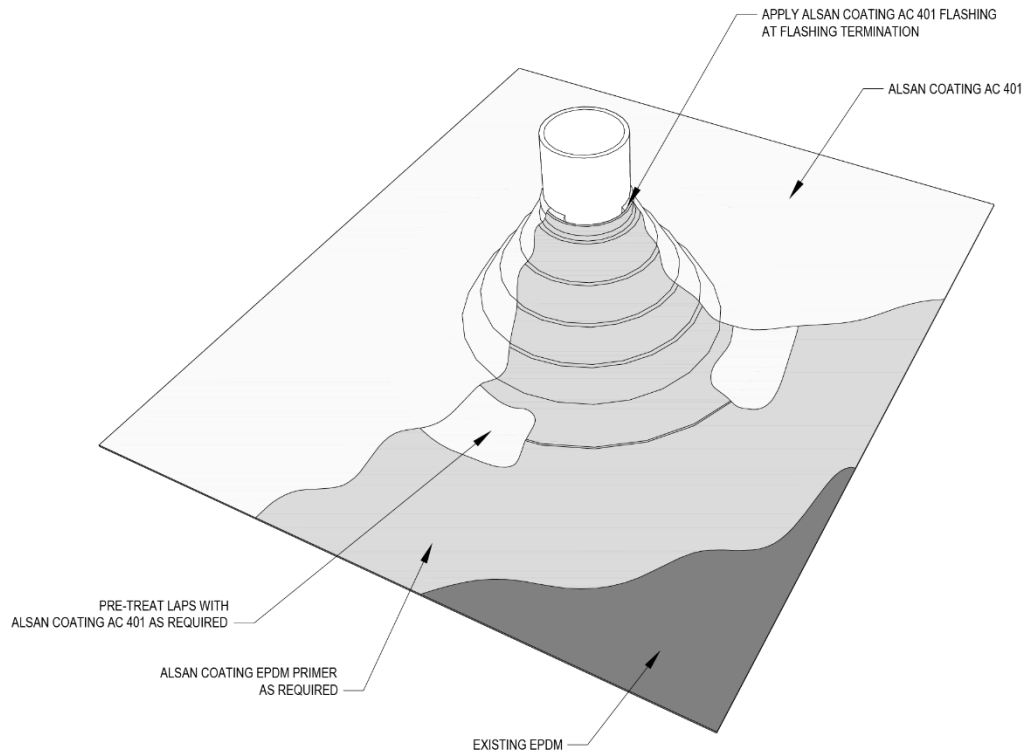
Acrylic Roof Coating Over EPDM, Penetration
